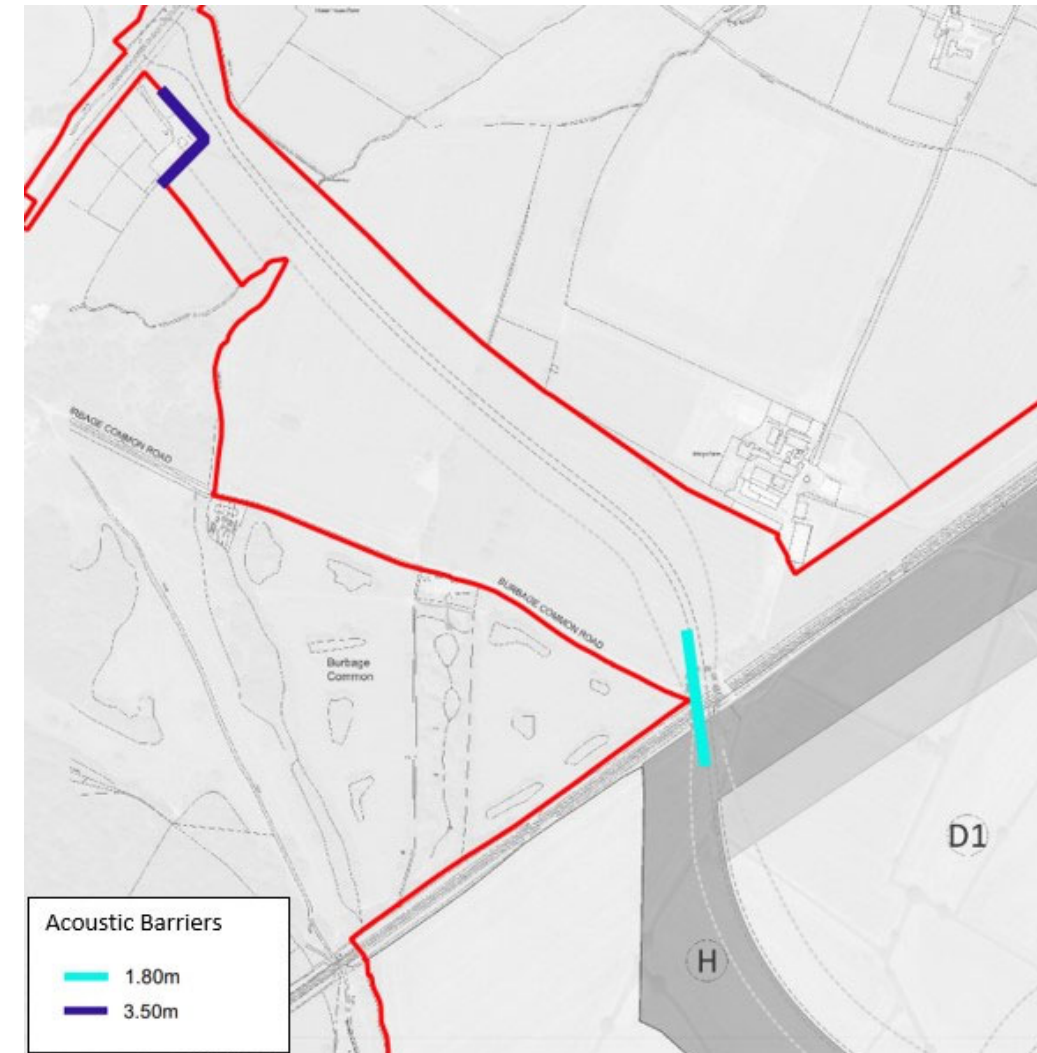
Proposed Noise Barriers on new bridge on A47 Link road and adjacent to the junction with Leicester Road. (Document Reference 6.3.10.10)
